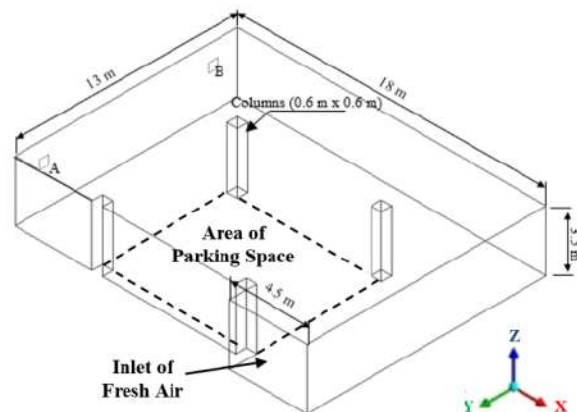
Dimension of Enclosed Parking Garage and Two Options of Exhaust Fan Position (A and B)
